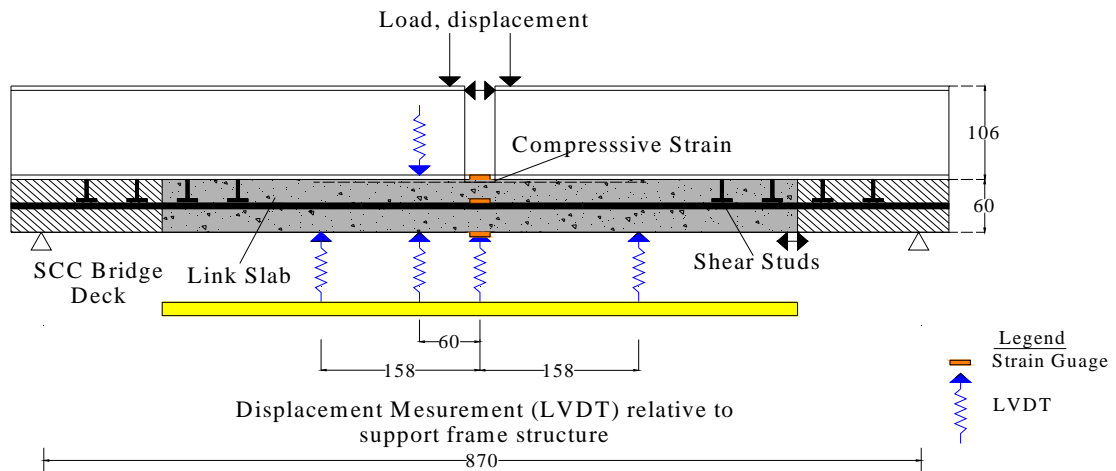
Test-setup, instrumentation and failure modes of specimen (Dimensions in mm)
